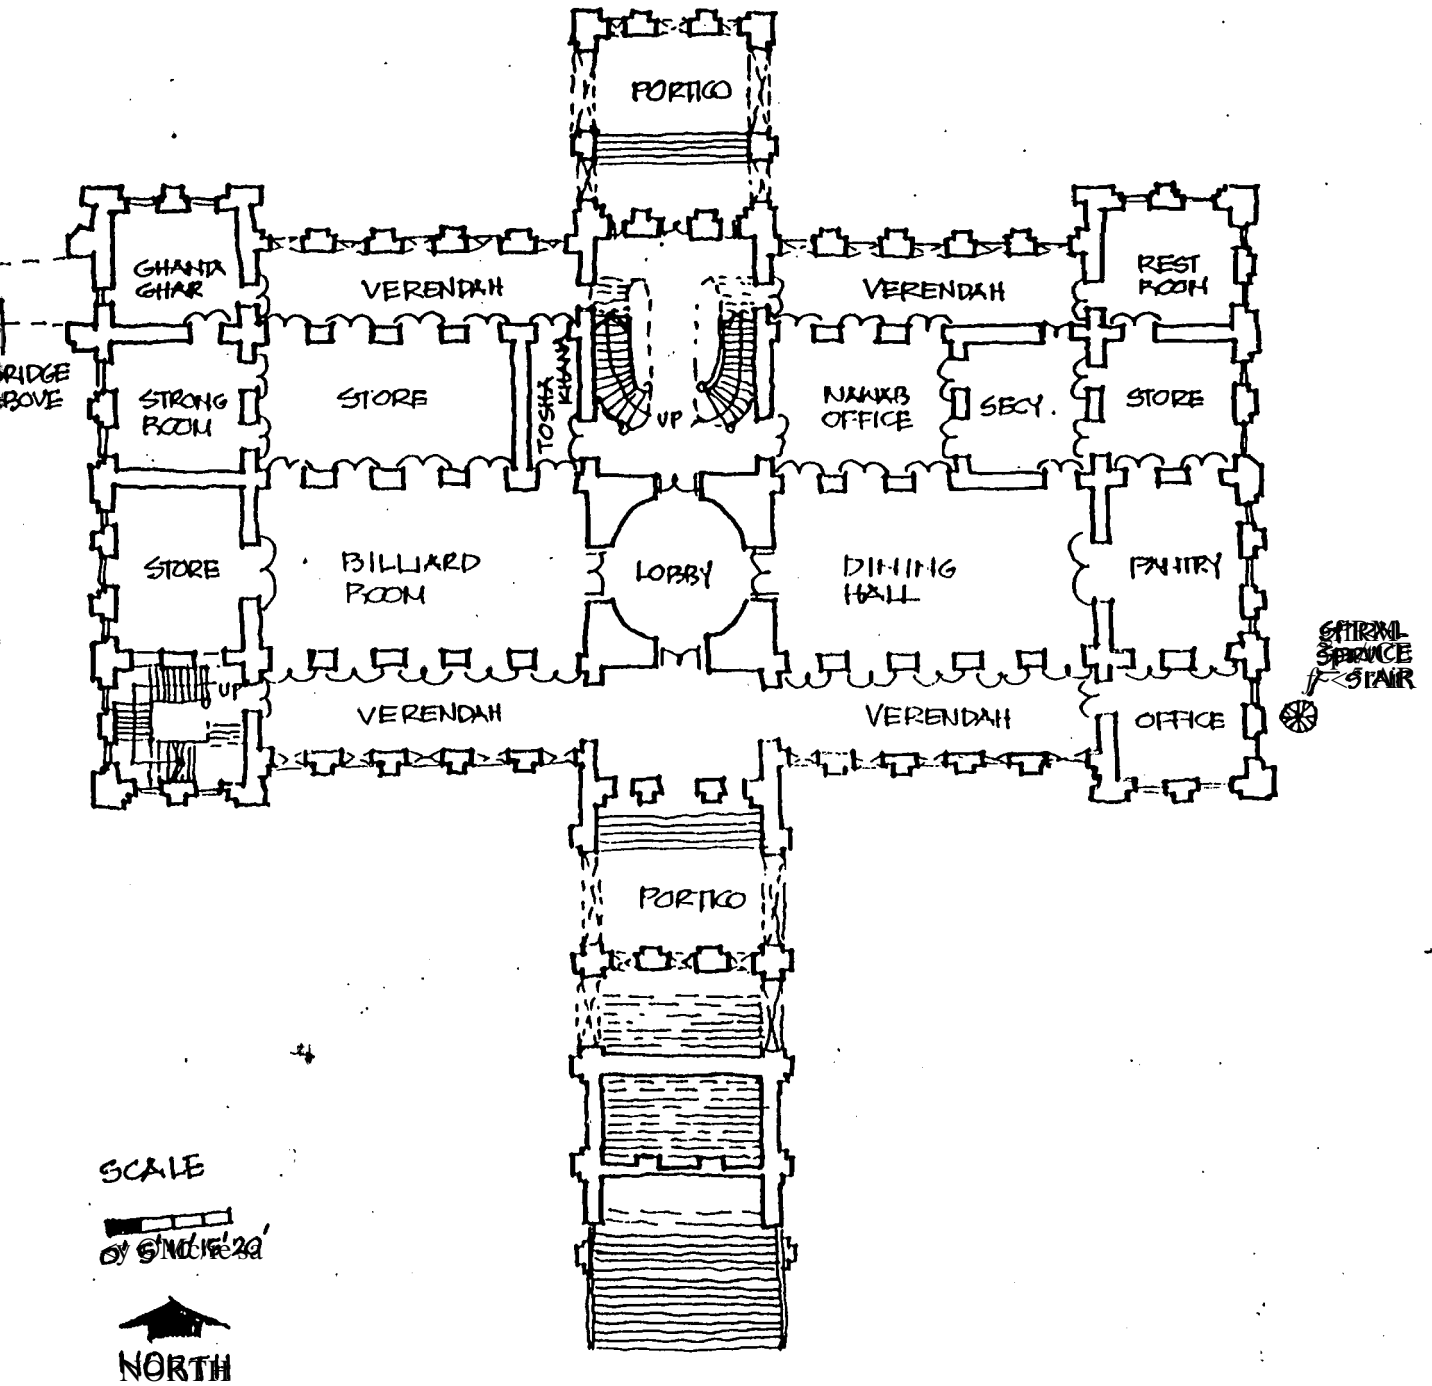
Ground floor plan, Ahsan manjil, Dhaka
